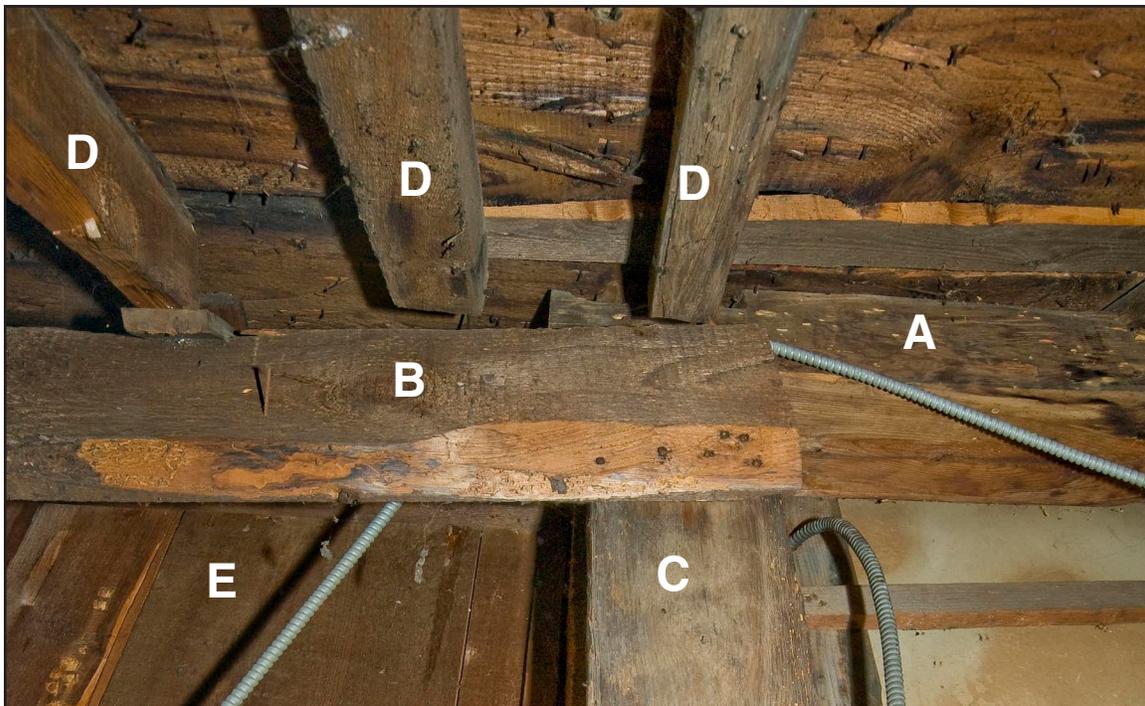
Attic leanto framing behind the northeast chamber (Room 203) at the junction of the original parlor chamber and the original chimney bay at the rear chimney post (C). "A" is the original leanto roof plate that ends just to the left of post "C". "B" is the ledger that was installed in the 1840s to carry the roof rafters in place of plate "A". Leanto rafters are marked "D". The boards "E" may be more feather edged sheathing, and are currently covered by wallboard at the rear wall of the northeast chamber.
